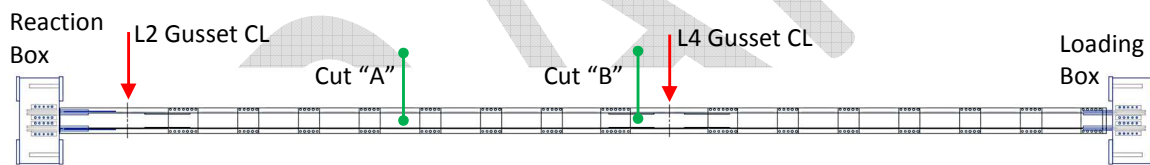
Plan view sketch of two-channel member specimens showing locations of the member cuts
